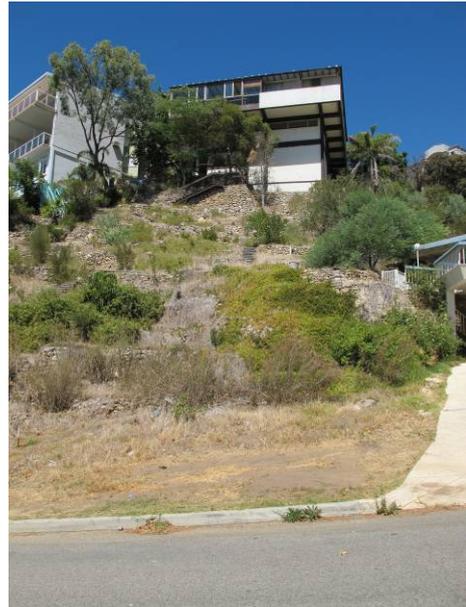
Looking at the site from The Coombe and Proposed Lot X
